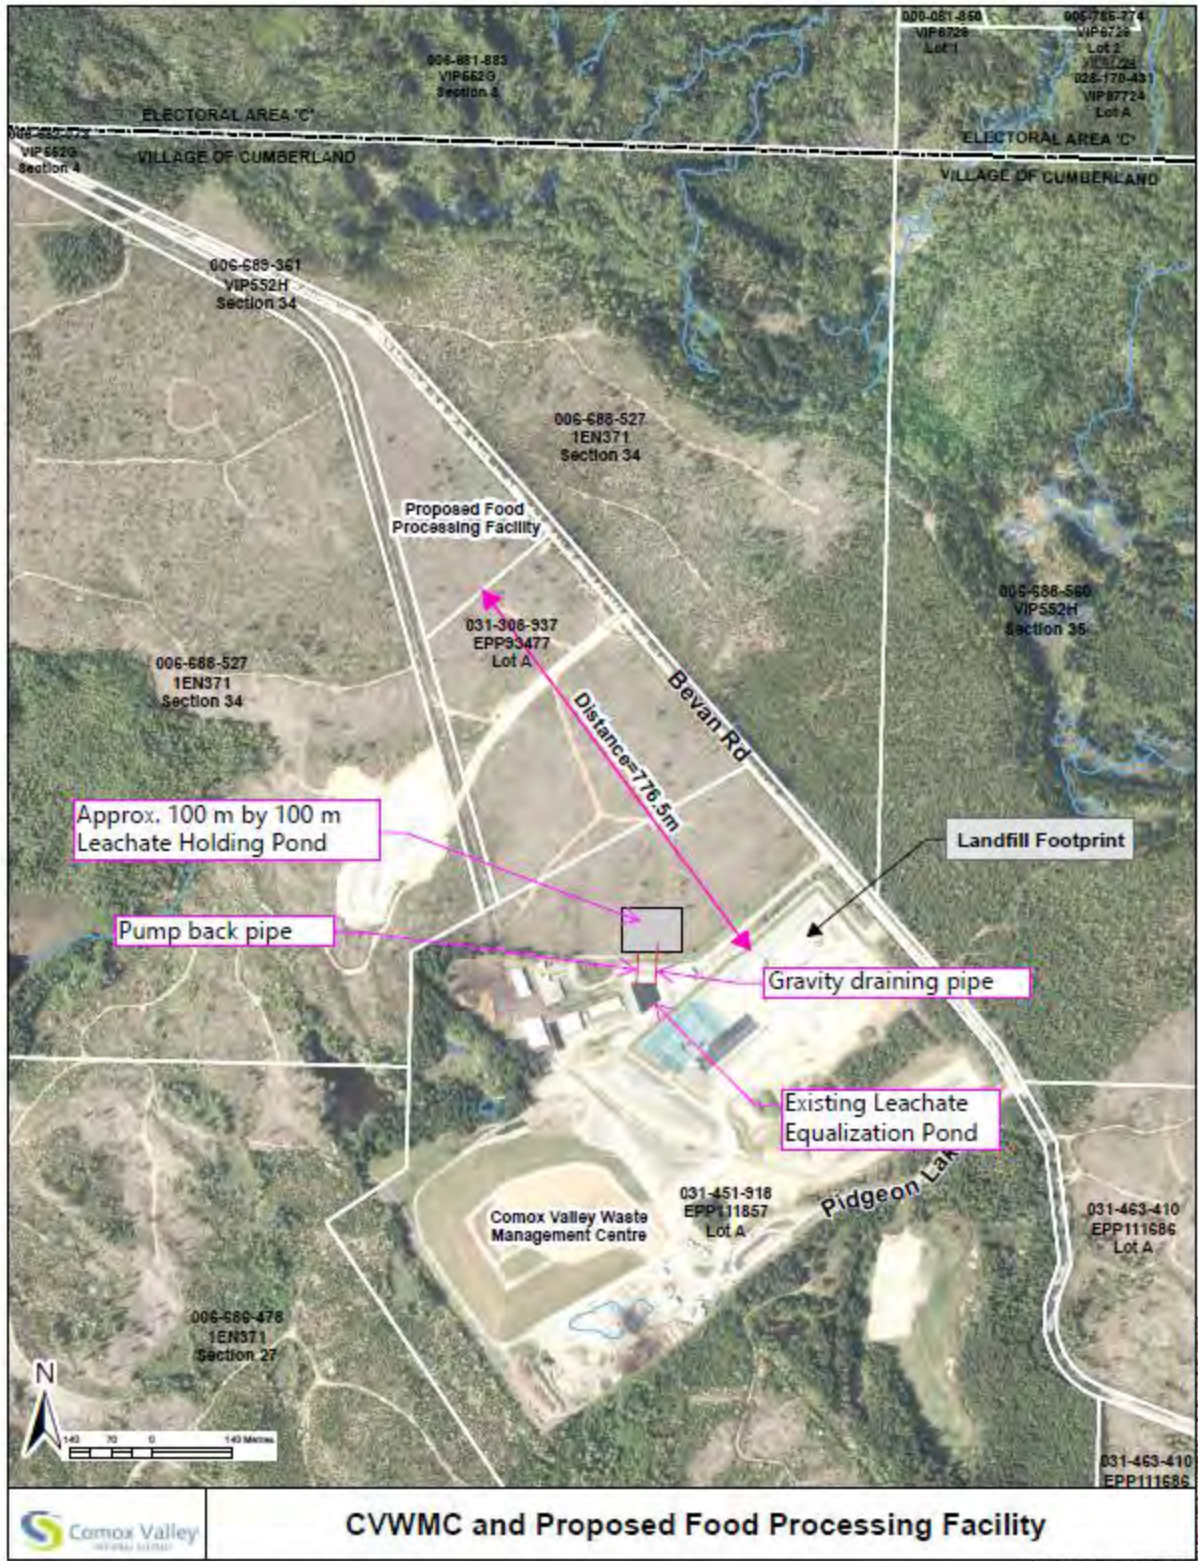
CVRD site plan for 3699 Bevan Rd, showing proposed secondary leachate holding pond location, approximate dimensions, and accessory pumps and drainage.
